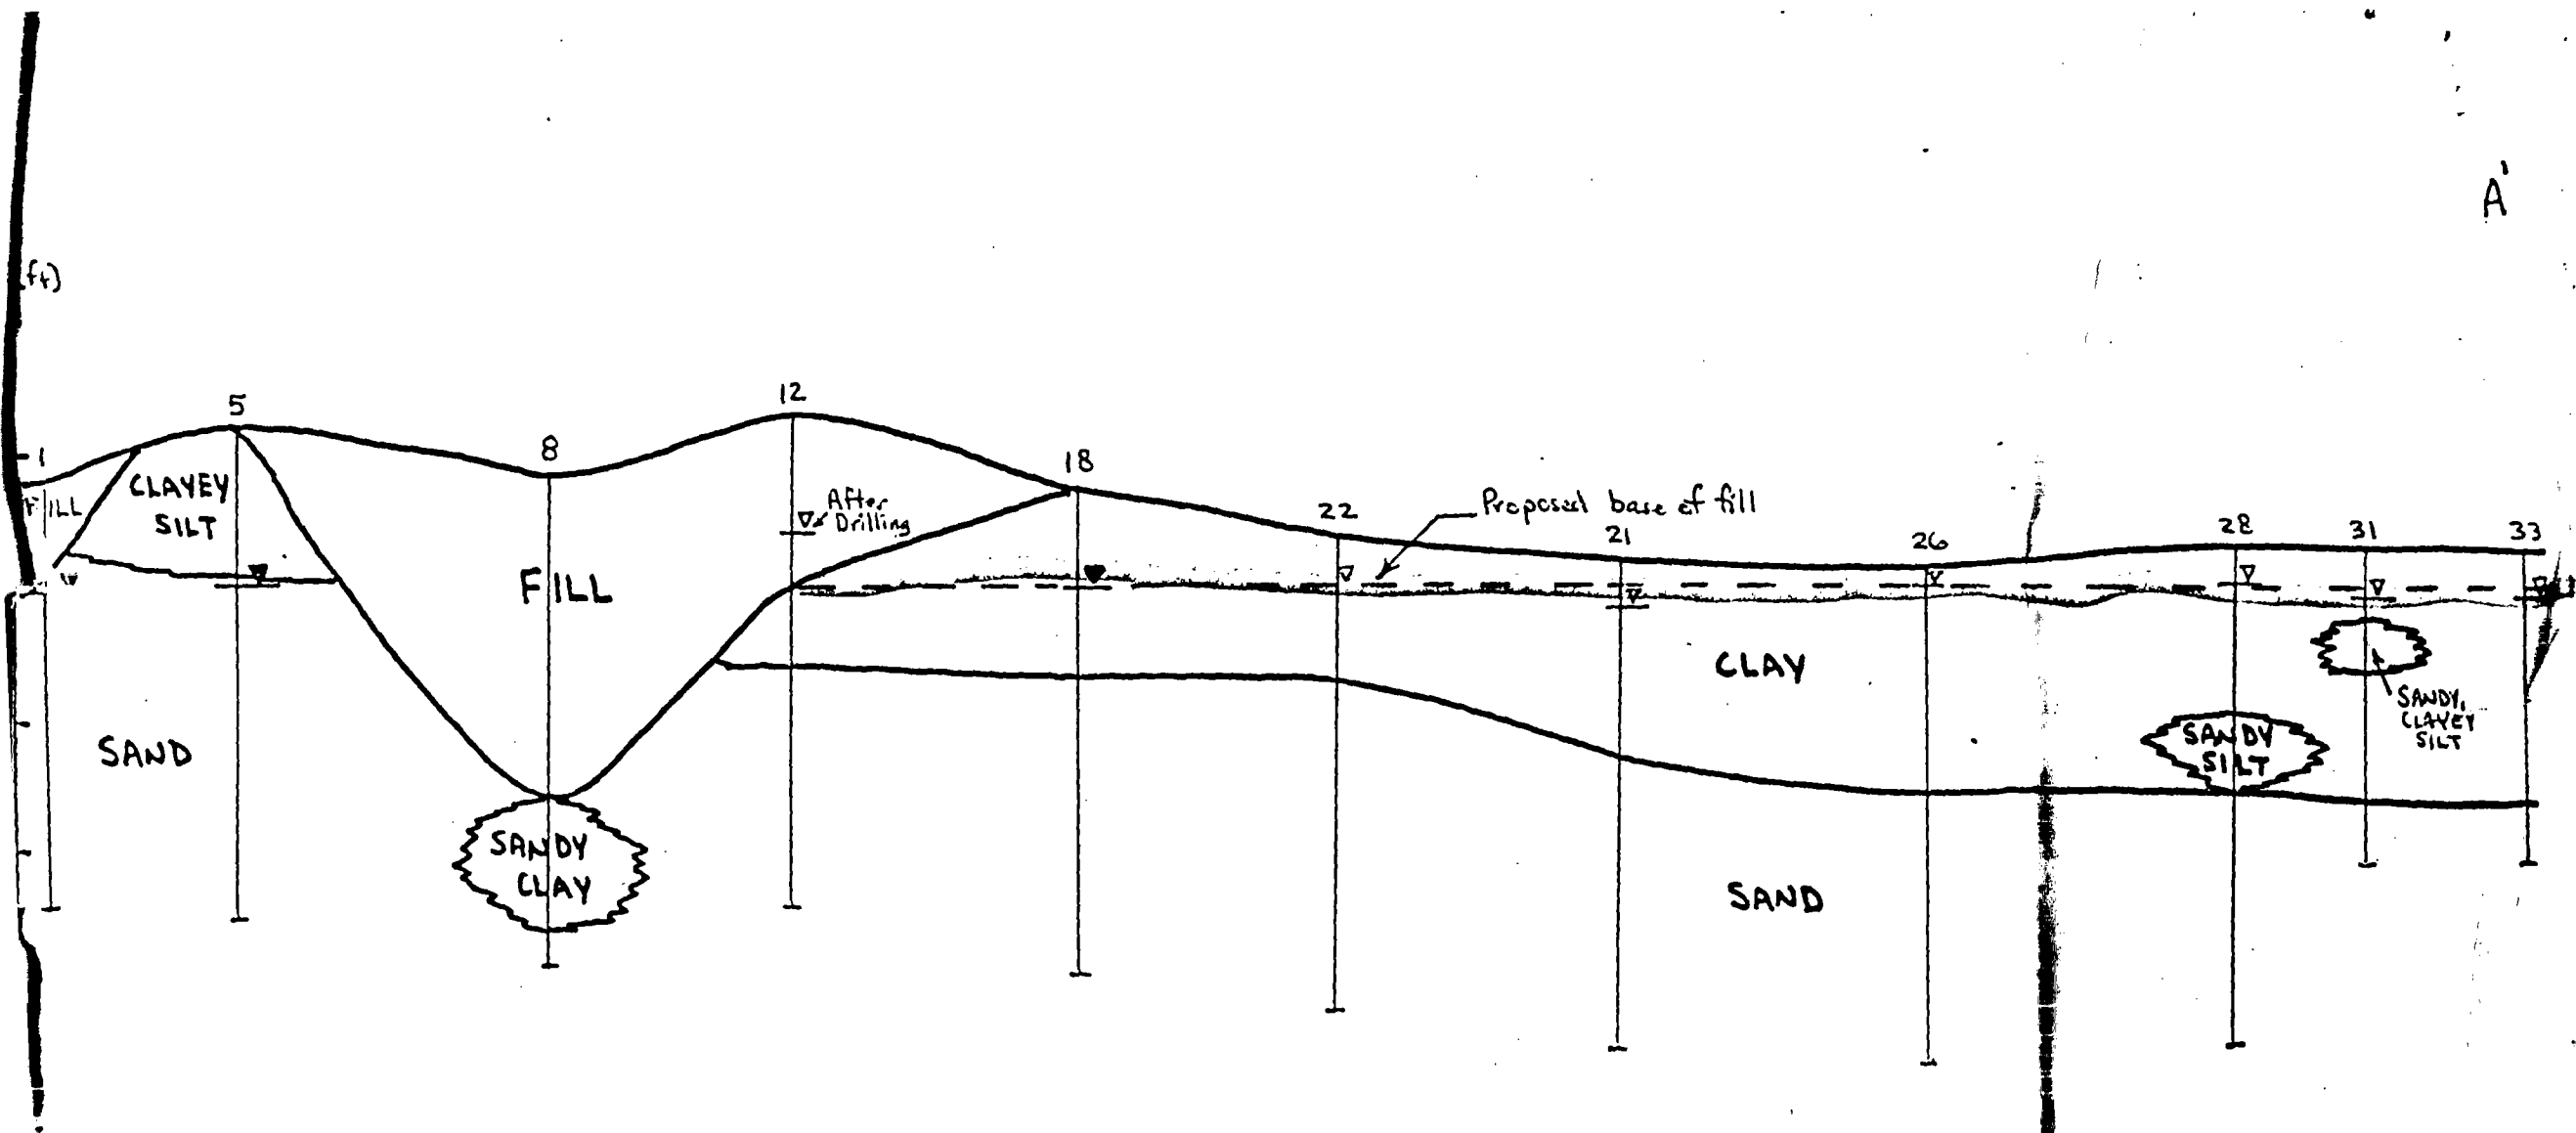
Schematic SW-NE cross section of East St. Louis/SCA-Milam landfill, St. Clair Co.
